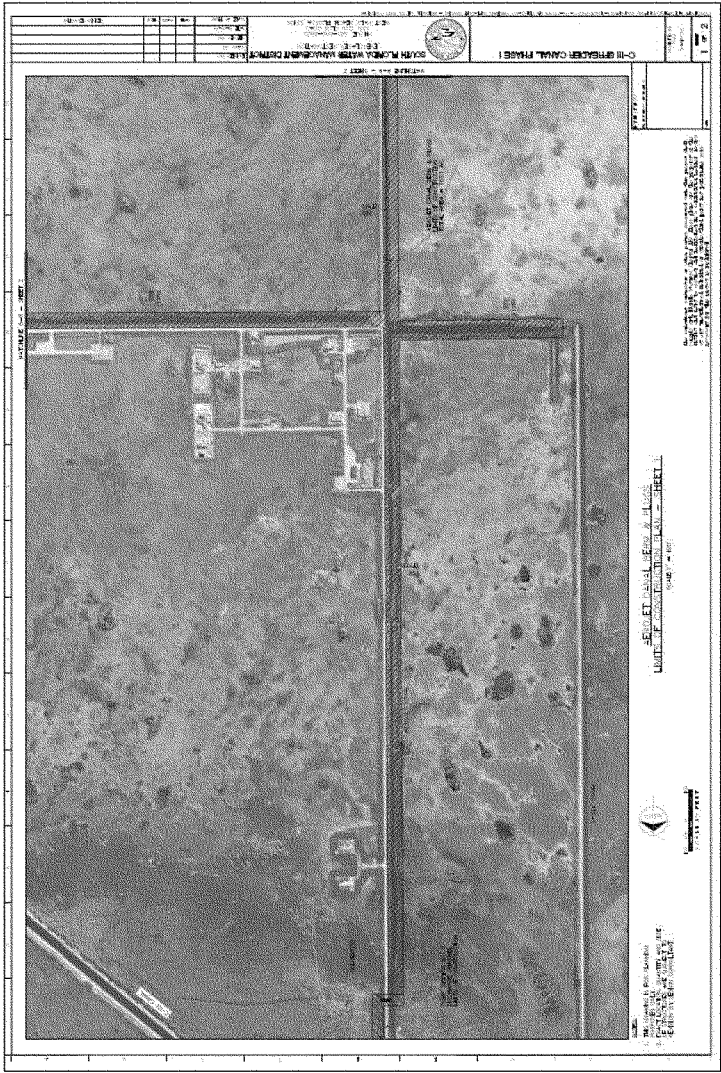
AEROJET CONSTRUCTION PLAN SHEET 1
